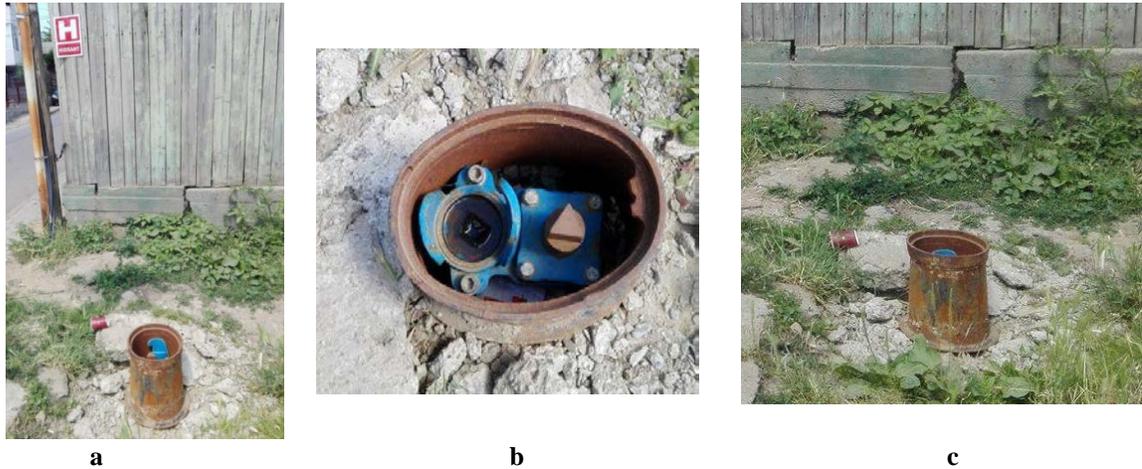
General view and details on the status of street hydrants: a - Overview Aurel Vlaicu street; b - interior details of the box; c - detail on the position of the sidewalk
